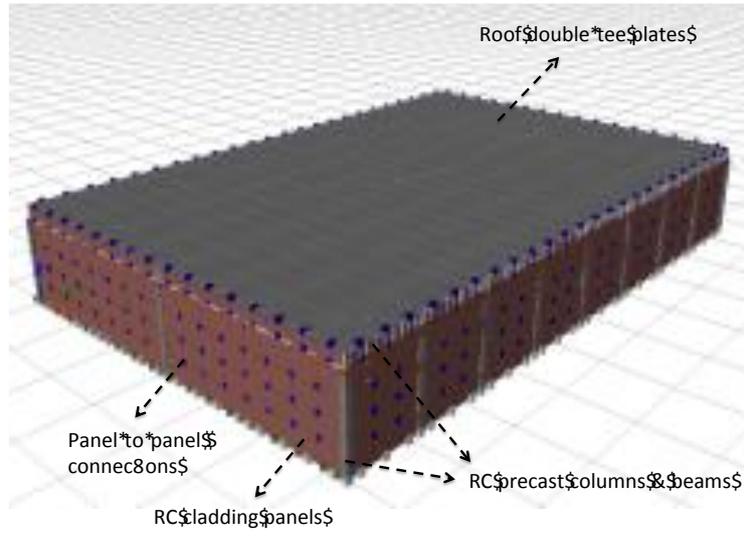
A 3D numerical model of the RC precast structure in SeismoStruct with cladding panels and roofing elements
